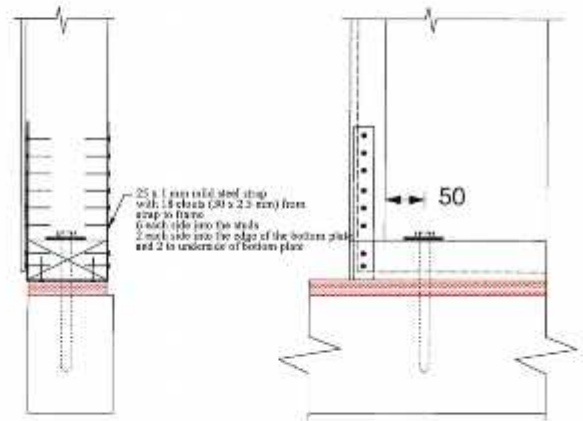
Fixing 0.6 m Long Walls to Simulated Concrete Foundations
